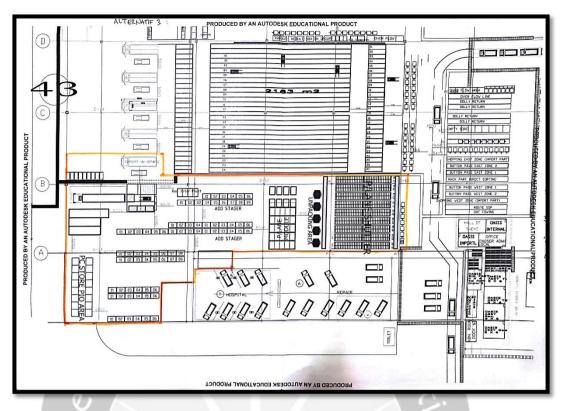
Location Layout (Only from Unloading Dock until Button Pass).
